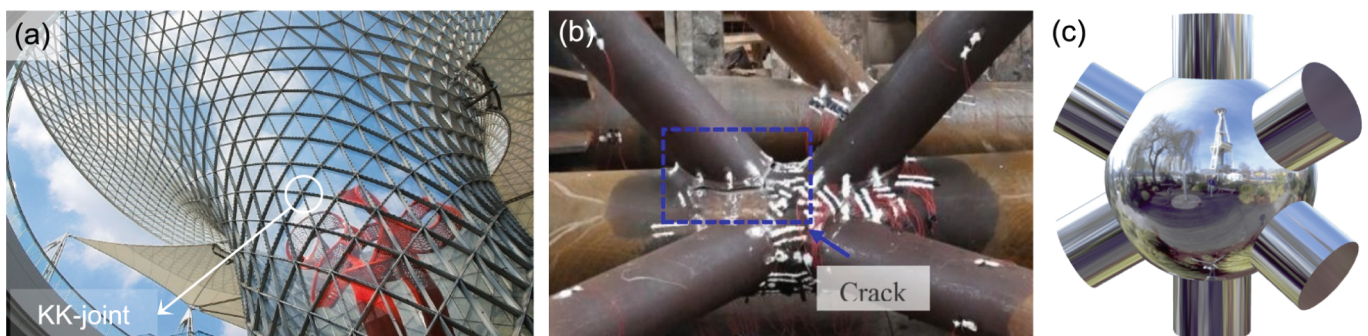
Gridshell joints: (a) Sun Valley of the Shanghai Expo Axis; (b) KK-type joints with braces welded to a chord [4]; (c) joints with members welded to a hollow sphere.
